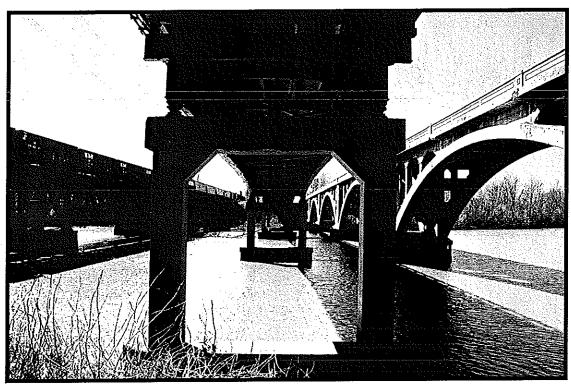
Looking south at piers of US 29/70 Bridge No. 2; Wilcox Bridge to right and North Carolina Railroad bridges to left.
